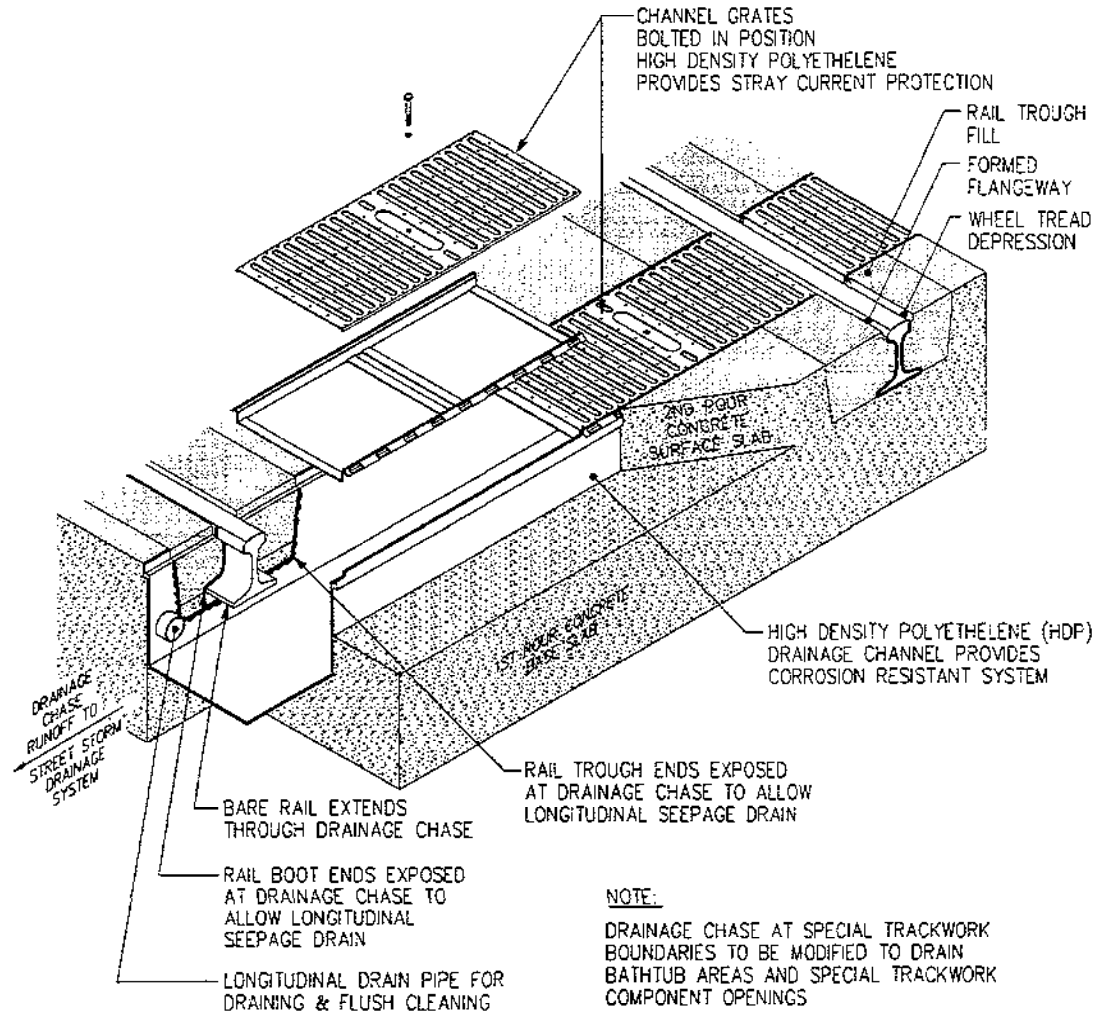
Cut Away Section Embedded Track Drainage Chase
